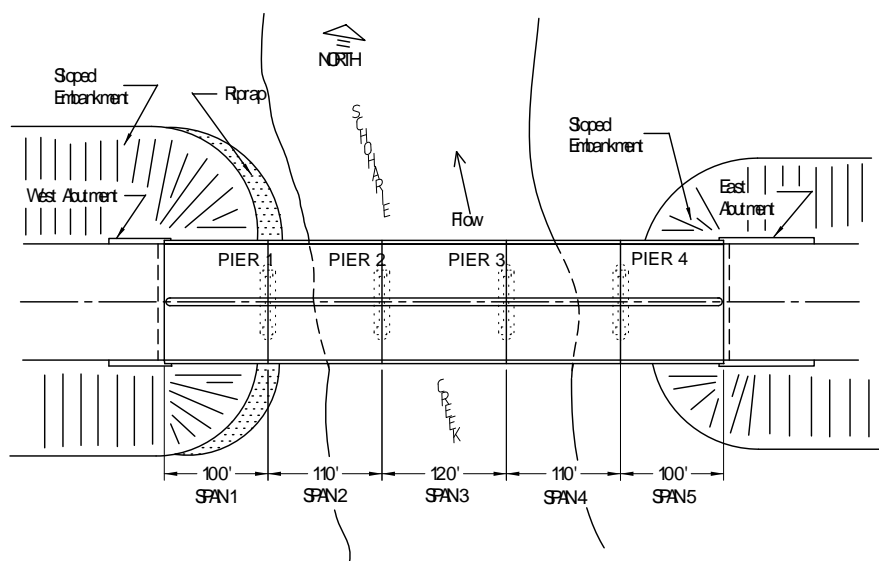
Schematic plan of bridge (after "Collapse," 1987)
